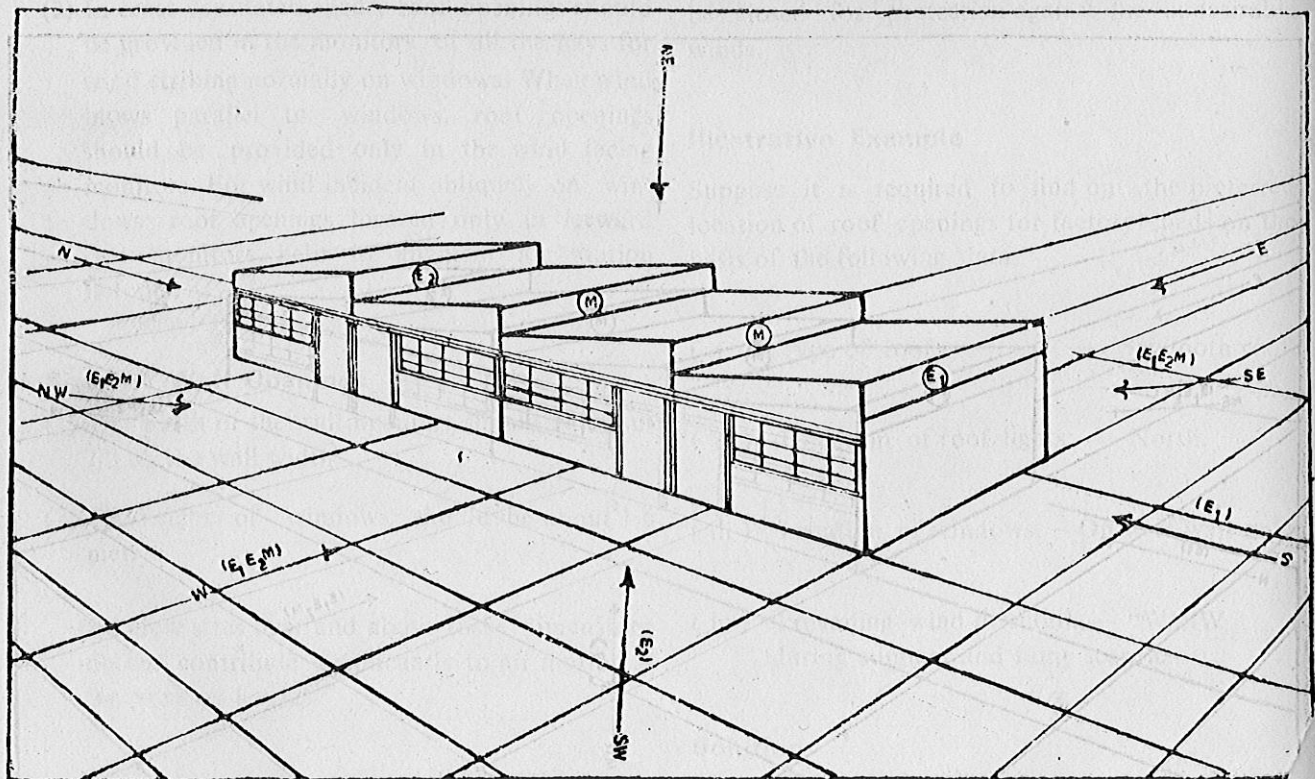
Preferred Location of Roof Openings in Southlight Sheds Having Windows on West Wall Only.
